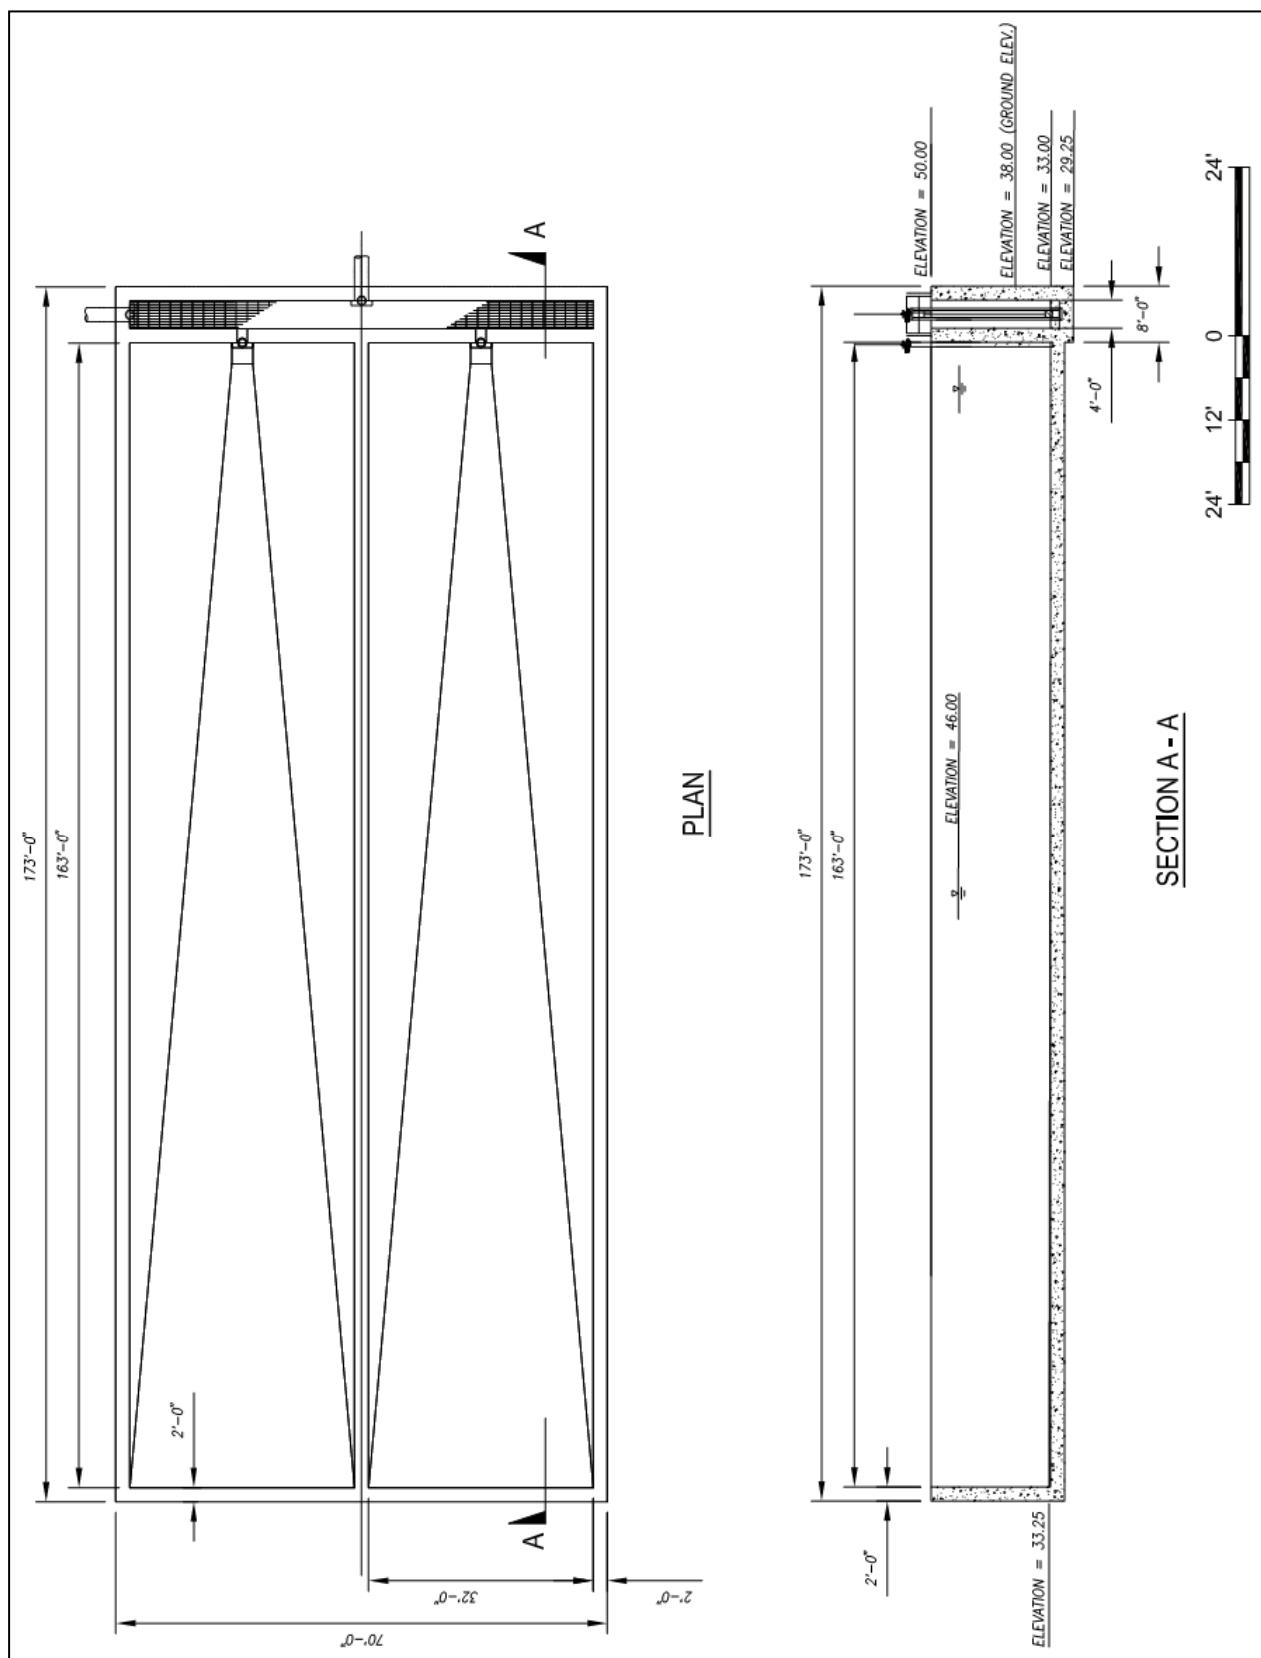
Option 2: Plan and Section Views – 1 MG EQ Basin at Effluent Holding Pond
